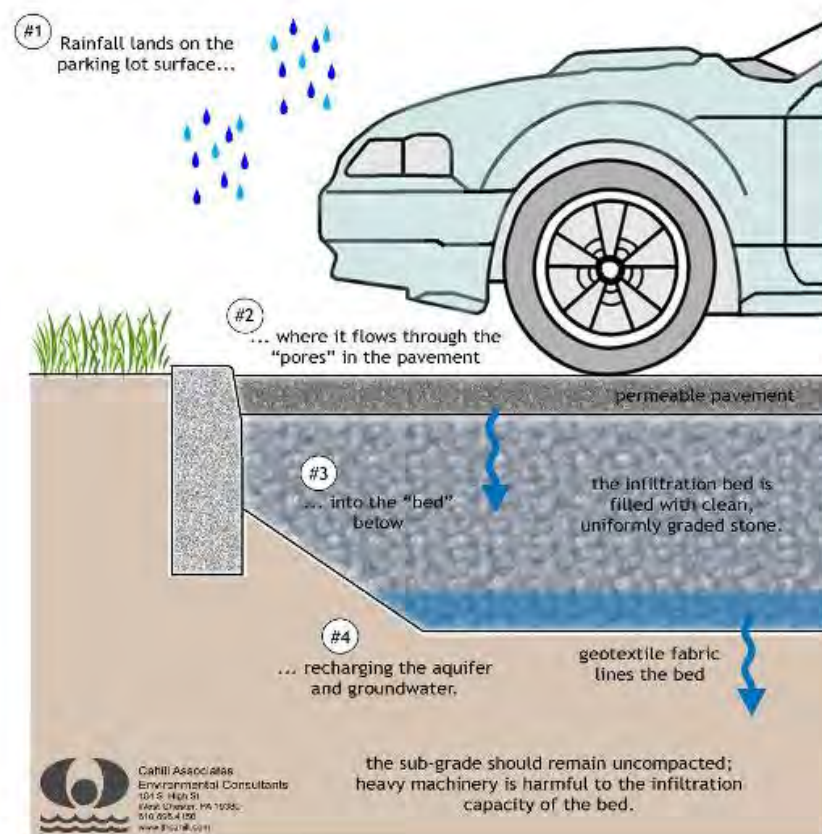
Cross-section showing design components of a permeable pavement with subsurface infiltration bed. Where infiltration is infeasible, underdrains can be fitted into the subsurface bed.
